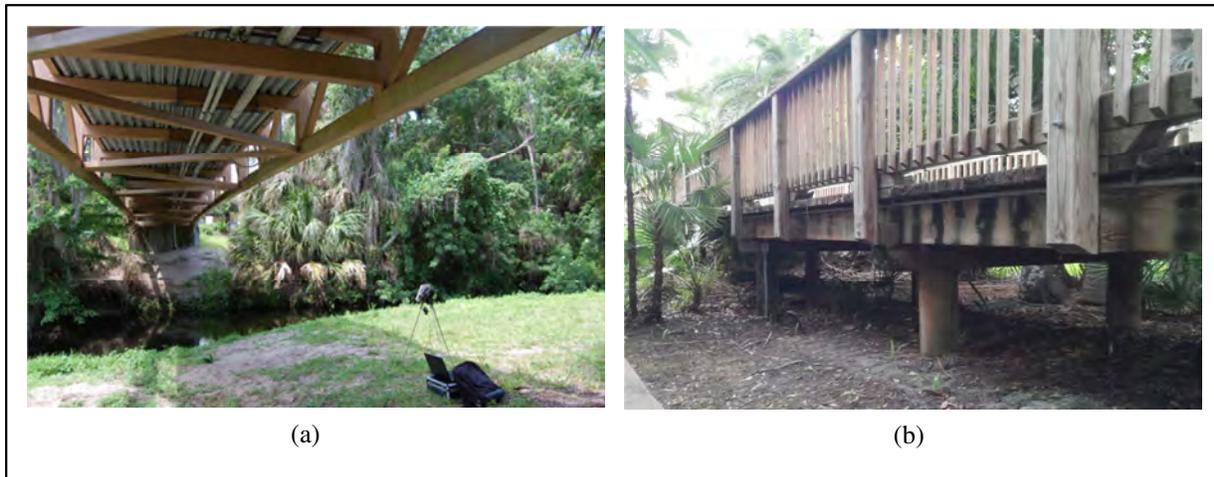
Bridges at FIT: (a) Underside CV Bridge (b) Wooden Pedestrian Bridge
